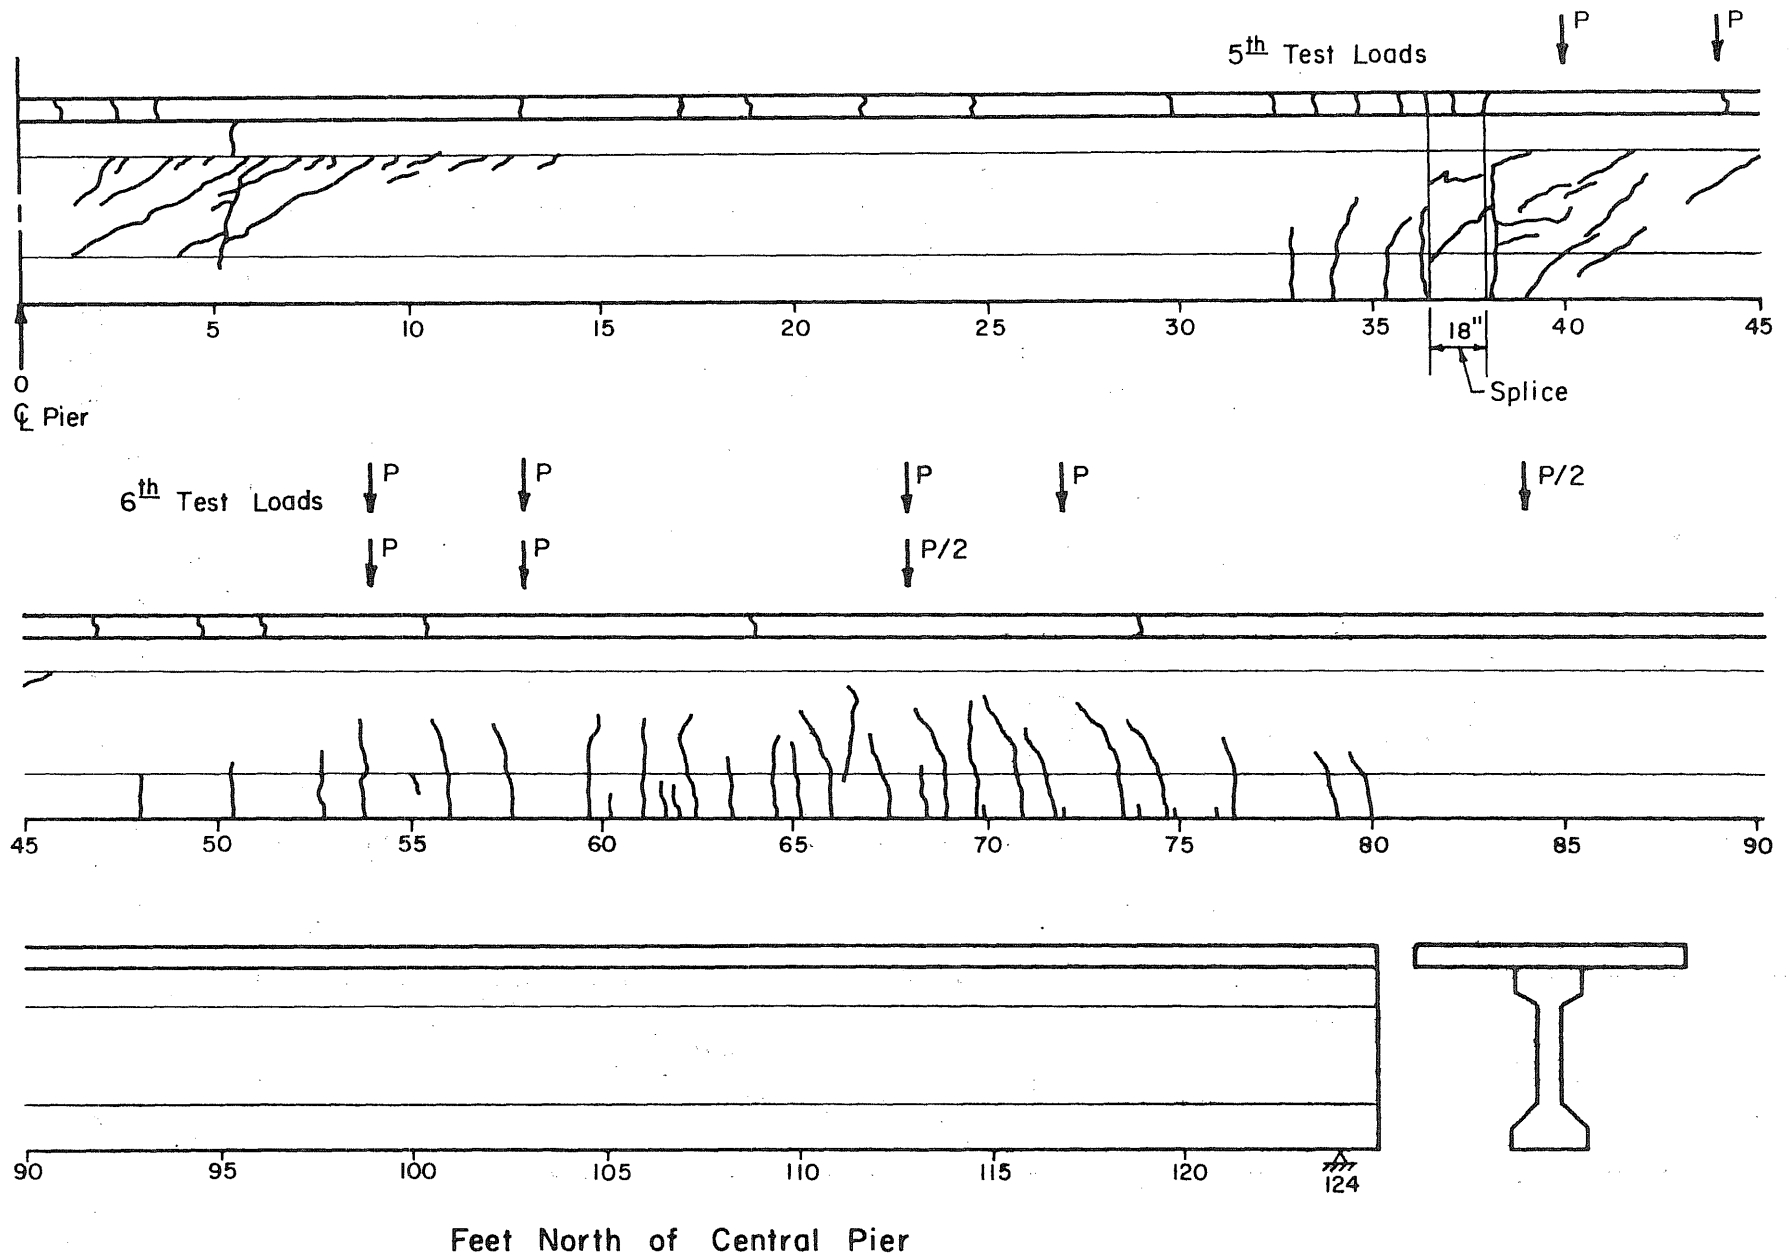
CRACKING IN NORTH SPAN AFTER COMPLETION OF TESTING
